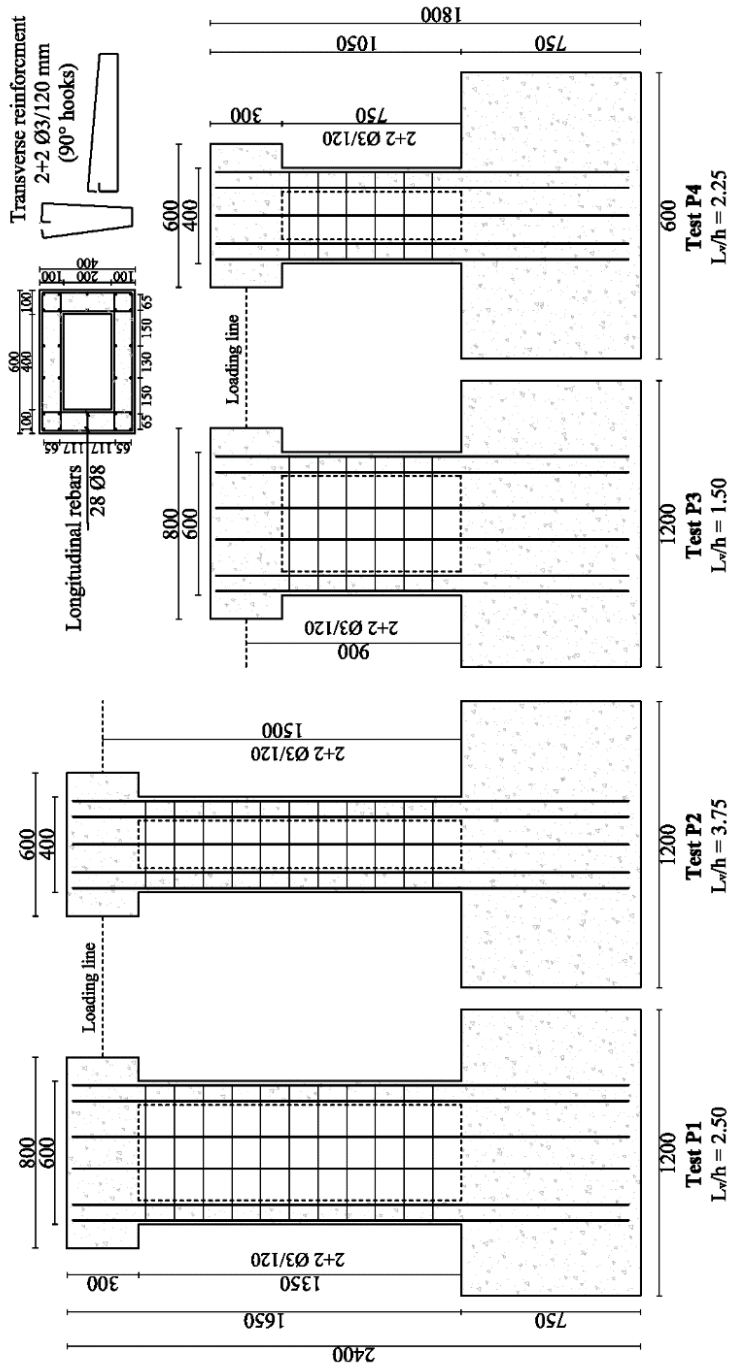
Geometry and reinforcement details (hollow rectangular specimens)
